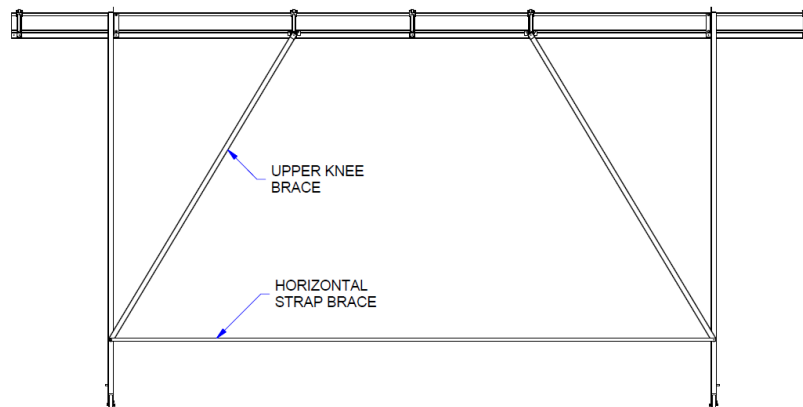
Single Knee Brace with Horizontal Strap Brace Layout
